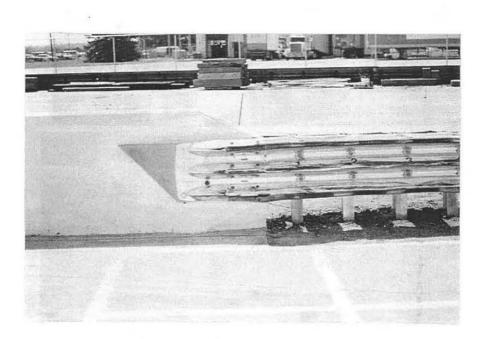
Approach Guardrail Transition Damage, Test MTSS-1
